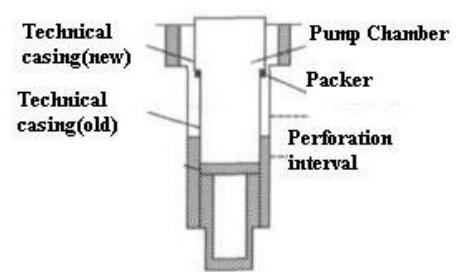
Section of oil well transformed with perforation method by rebuilding pump chamber
